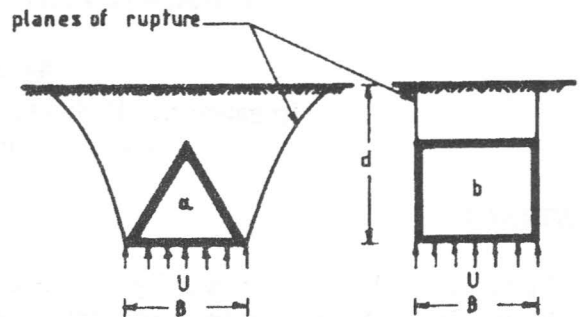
Behaviour of planes of failure due to uplift force, U , exerted on; a-triangular shape, and b- Box shape
